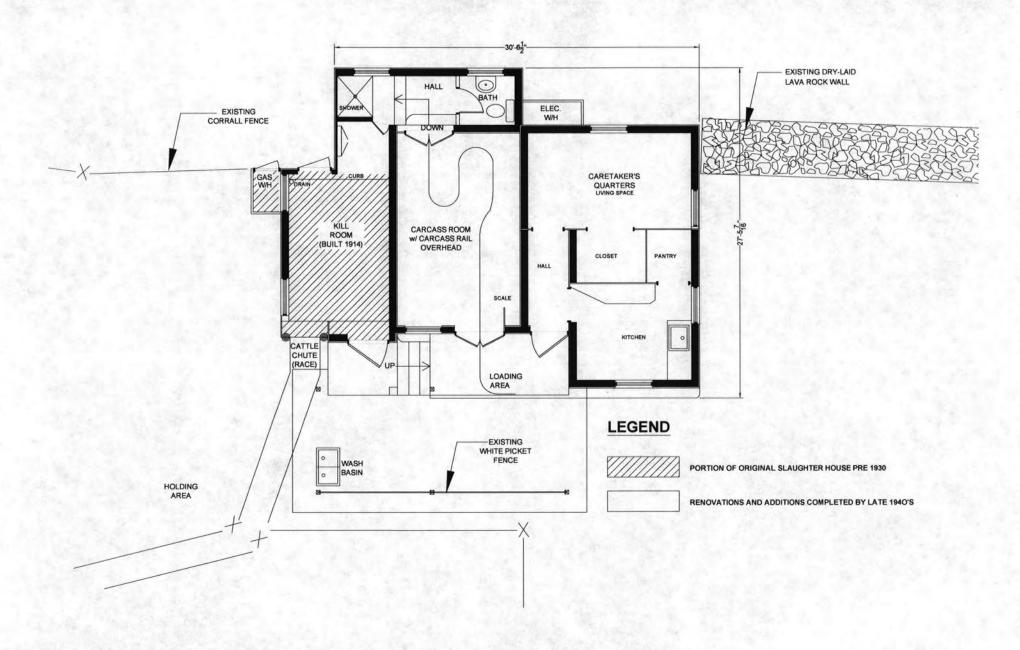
FIGURE F - BUILDING 2, SLAUGHTER HOUSE FLOOR PLAN
